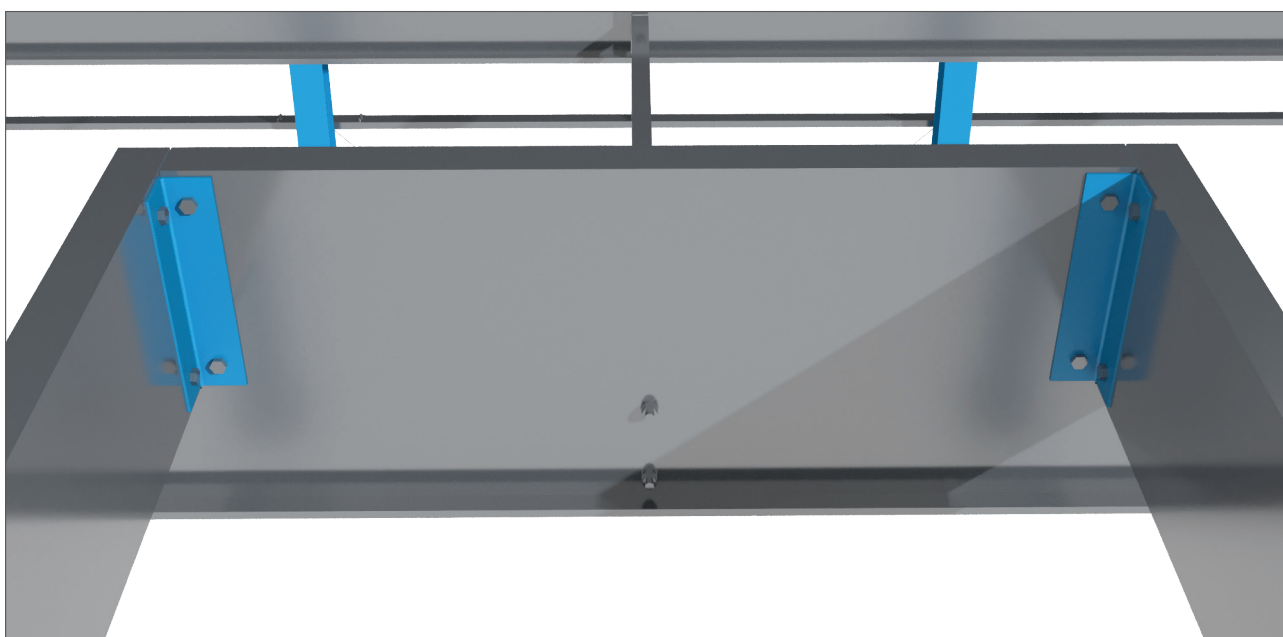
Detail of the interconnection of the skylight frame elements by means of bolts and an atypical angle piece
